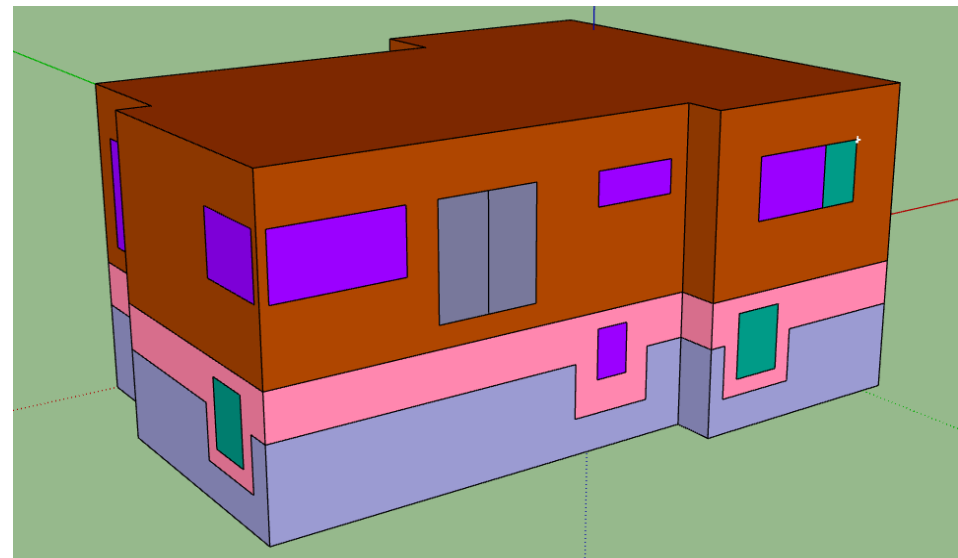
Building geometry with different wall types, windows, and doors drawn in.
